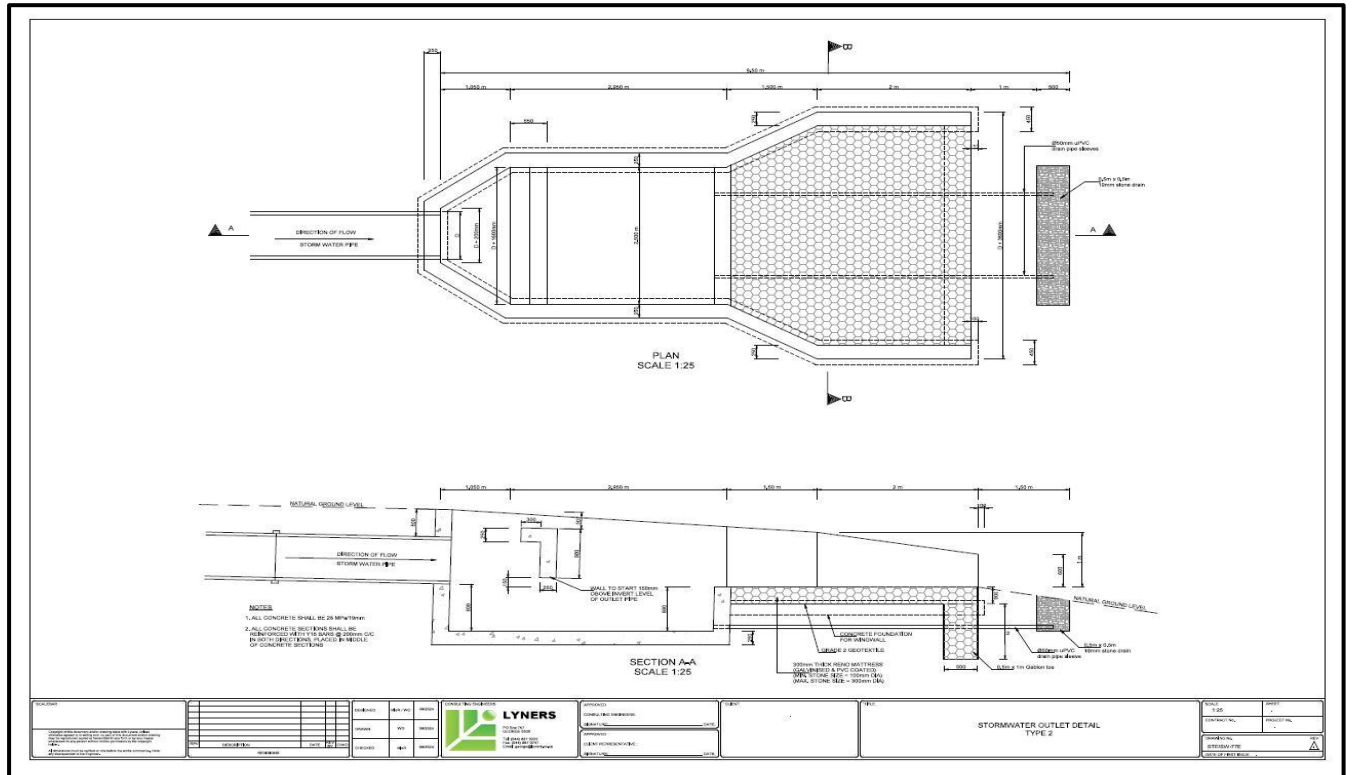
Stormwater Outlet Structure Design Drawing 1.
